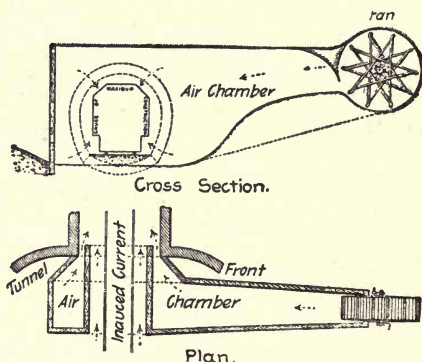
The Saccardo System of Tunnel Ventilation.
